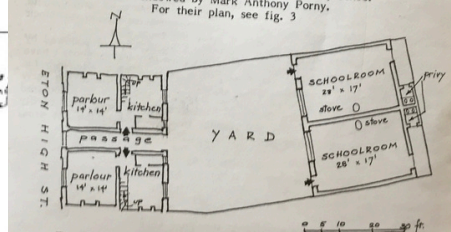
Plan of the Charity School and masters' and mistresses' houses as built in 1813-13. The High Street is at the left; fig. 2 shows the elevation on that side
